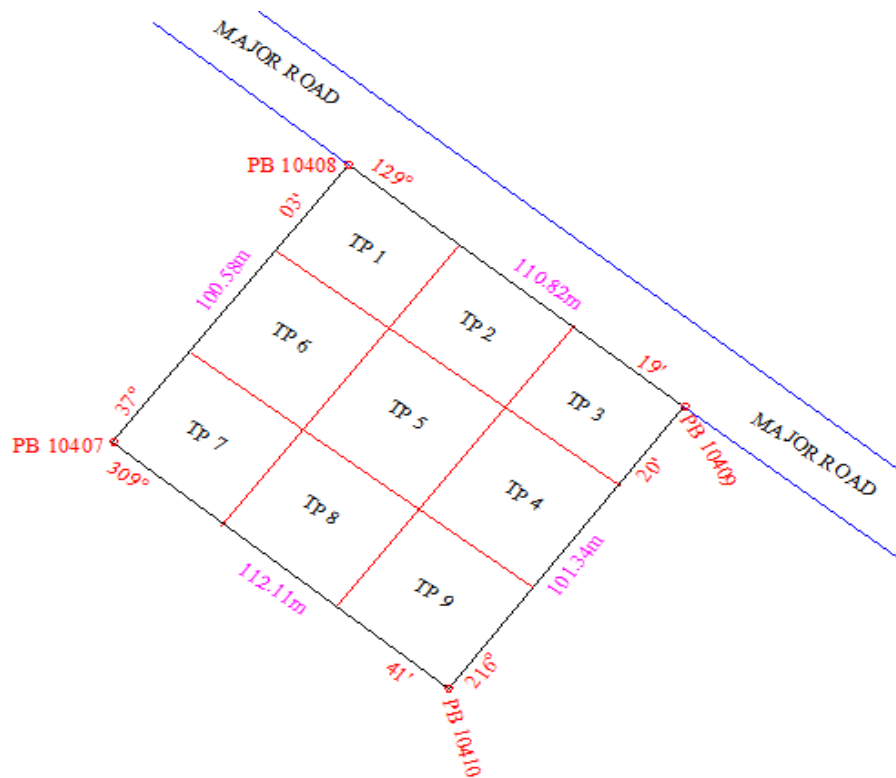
Showing trial pit (TP) points within the Site plan of the proposed estate development
